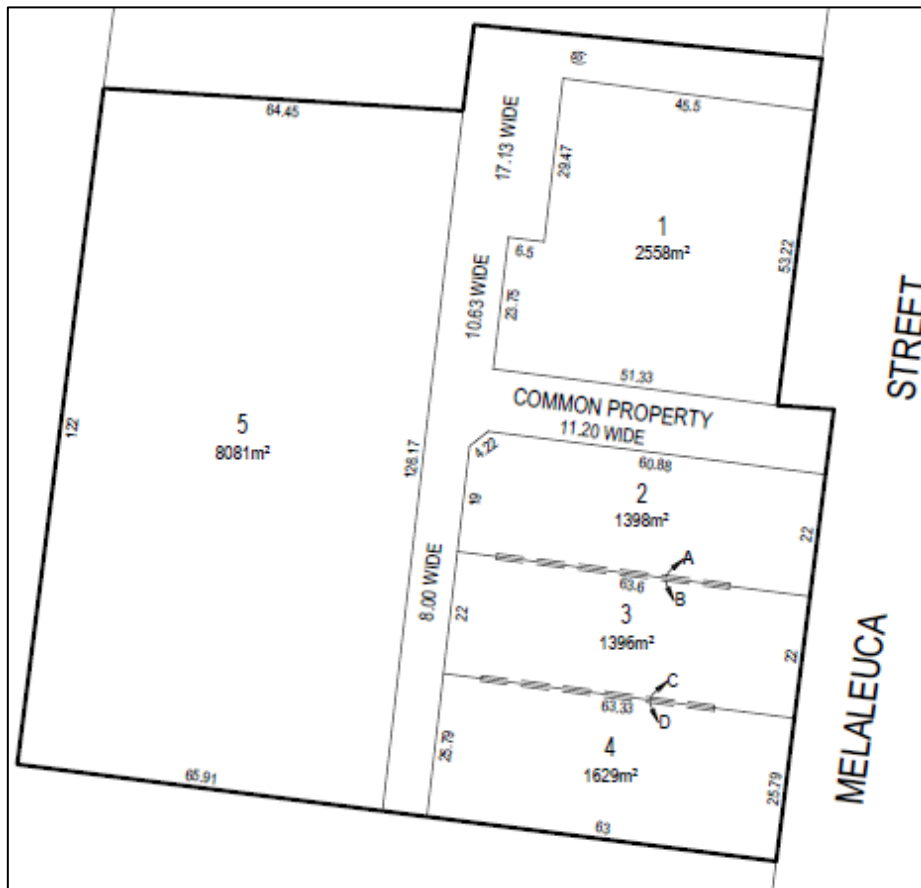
Proposed 5 lot subdivision (Source: Subdivision Plan)
